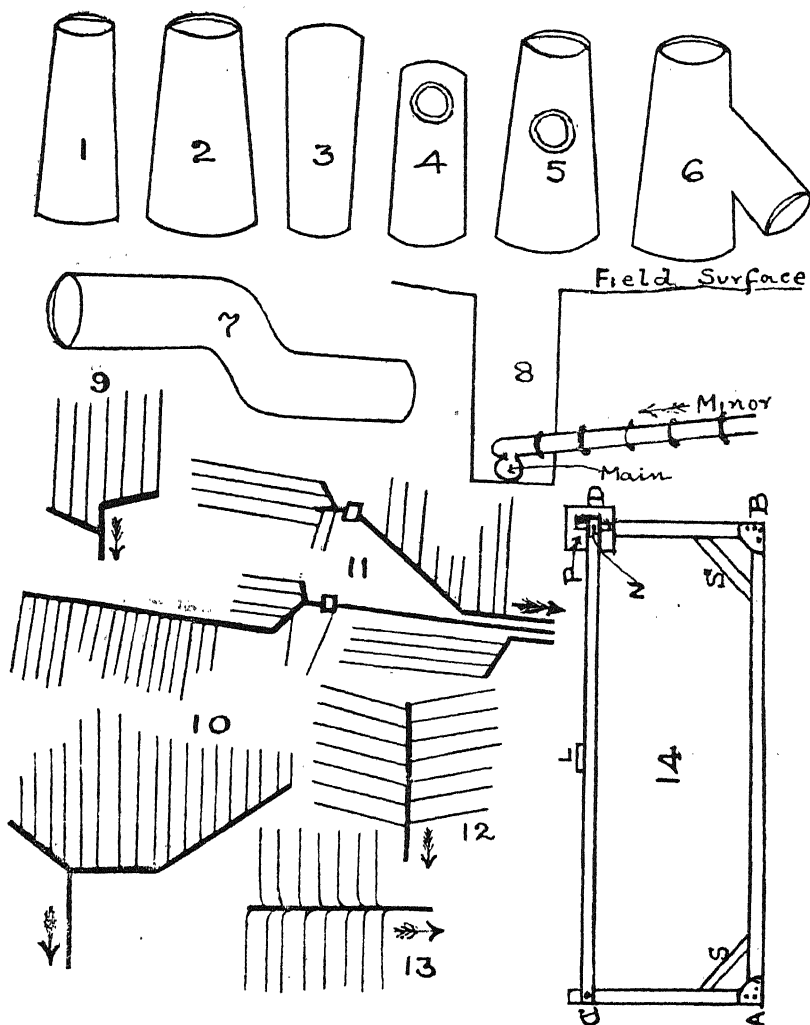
The 'Grader' used for grading the bed of the drains to the necessary slope before laying the pipes. A B is a plank 2 inches \times 1 inch and 10 feet long placed horizontal with A C and B D each 3 feet 6 inches \times 2 inches \times 1 inch fixed at right angles to it. S. S. are struts to keep A C and B D in position. C D is a plank similar to A B fixed at right angles to A C with the end D adjustable along a graduated brass plate P fixed on B D. The graduations on P are each equal to 0.01 foot. The end D is fixed in position after adjusting for the slope by the butter-fly nut N. L is a spirit level fixed at the top of C D when grading the drains. The bed of the drain, where the gardner is placed after adjustment, is graded when the bubble in L stands exactly in the centre.
